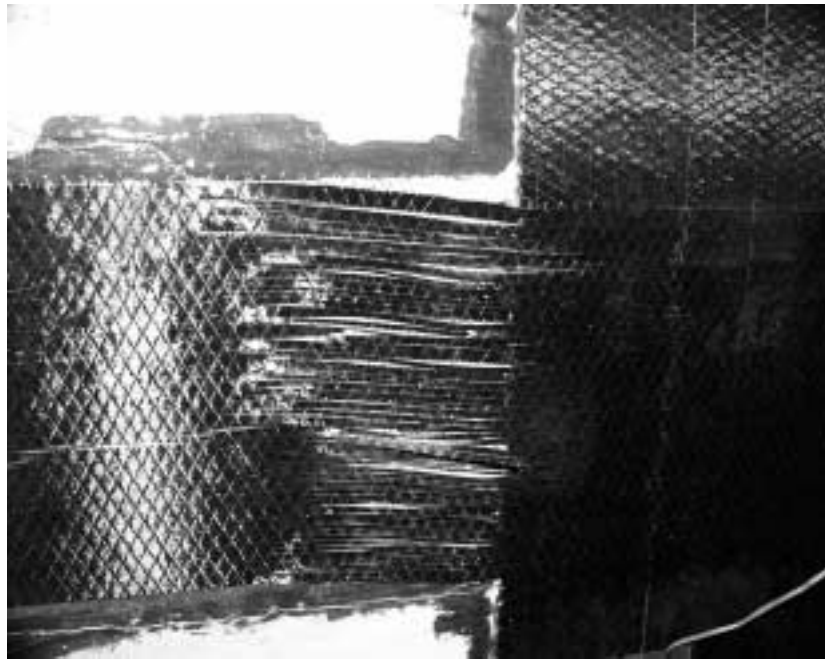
Deformation and Splitting of Transverse Sheet Caused by Movement of the Longitudinal Sheet
